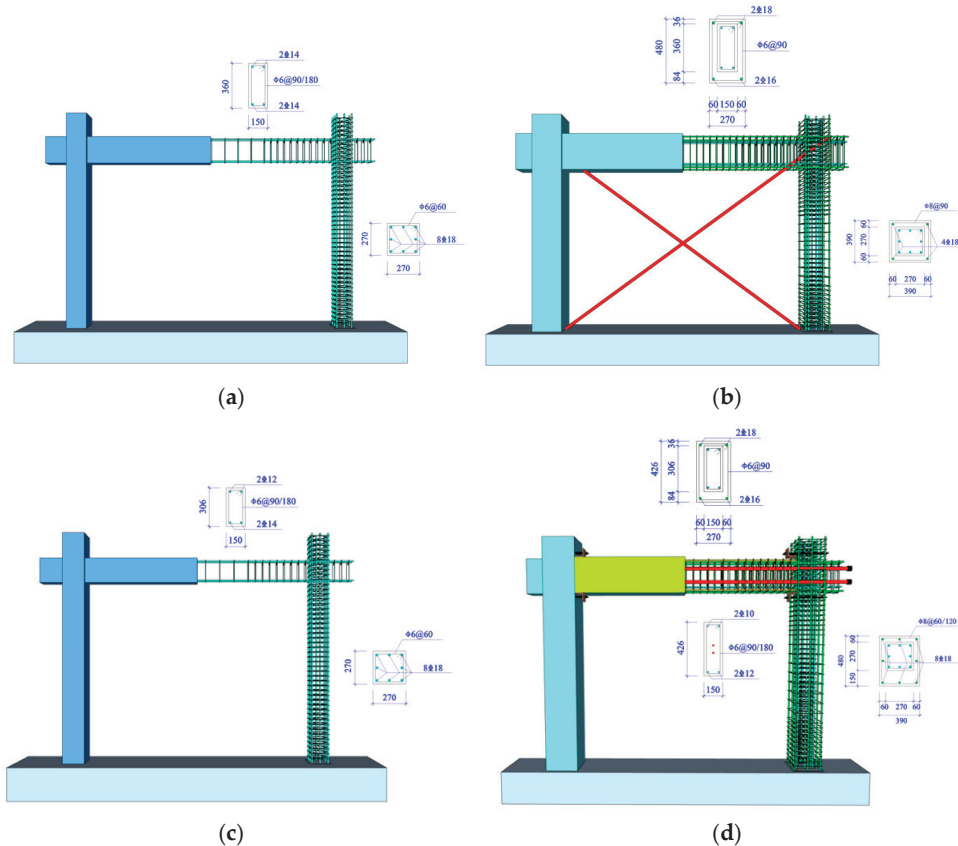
Schematic diagram and cross-section reinforcement of one-story one-span frame structures. (a) K1-1; (b) K1-2; (c) K2-1; (d) K2-2.
